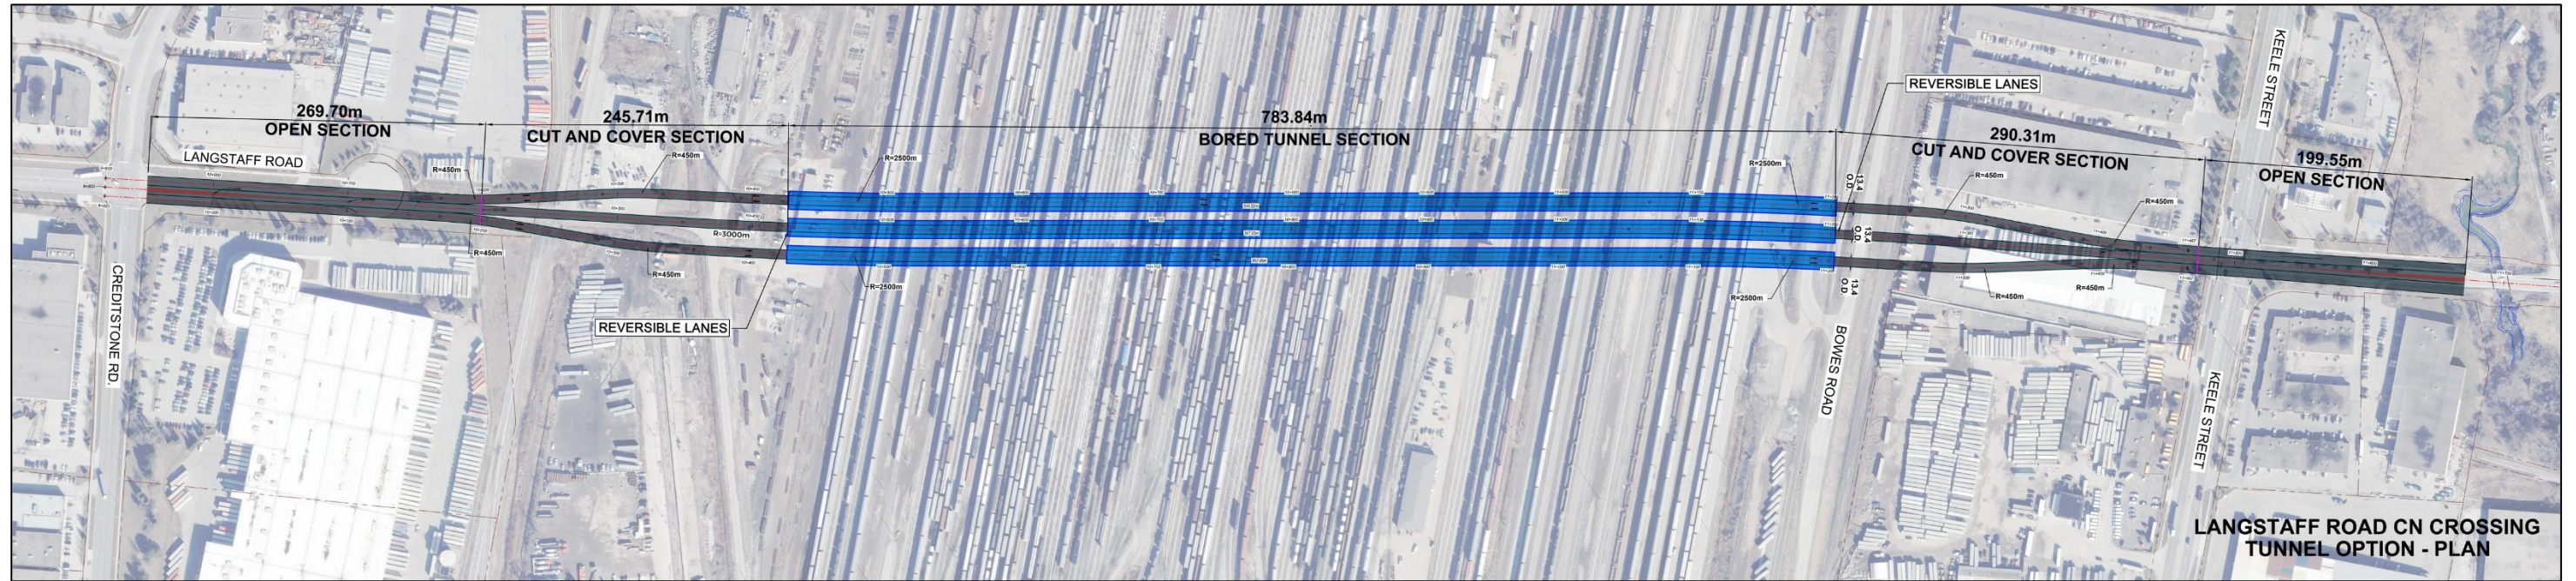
CN Crossing Alternative 4 – Tunnel Option
